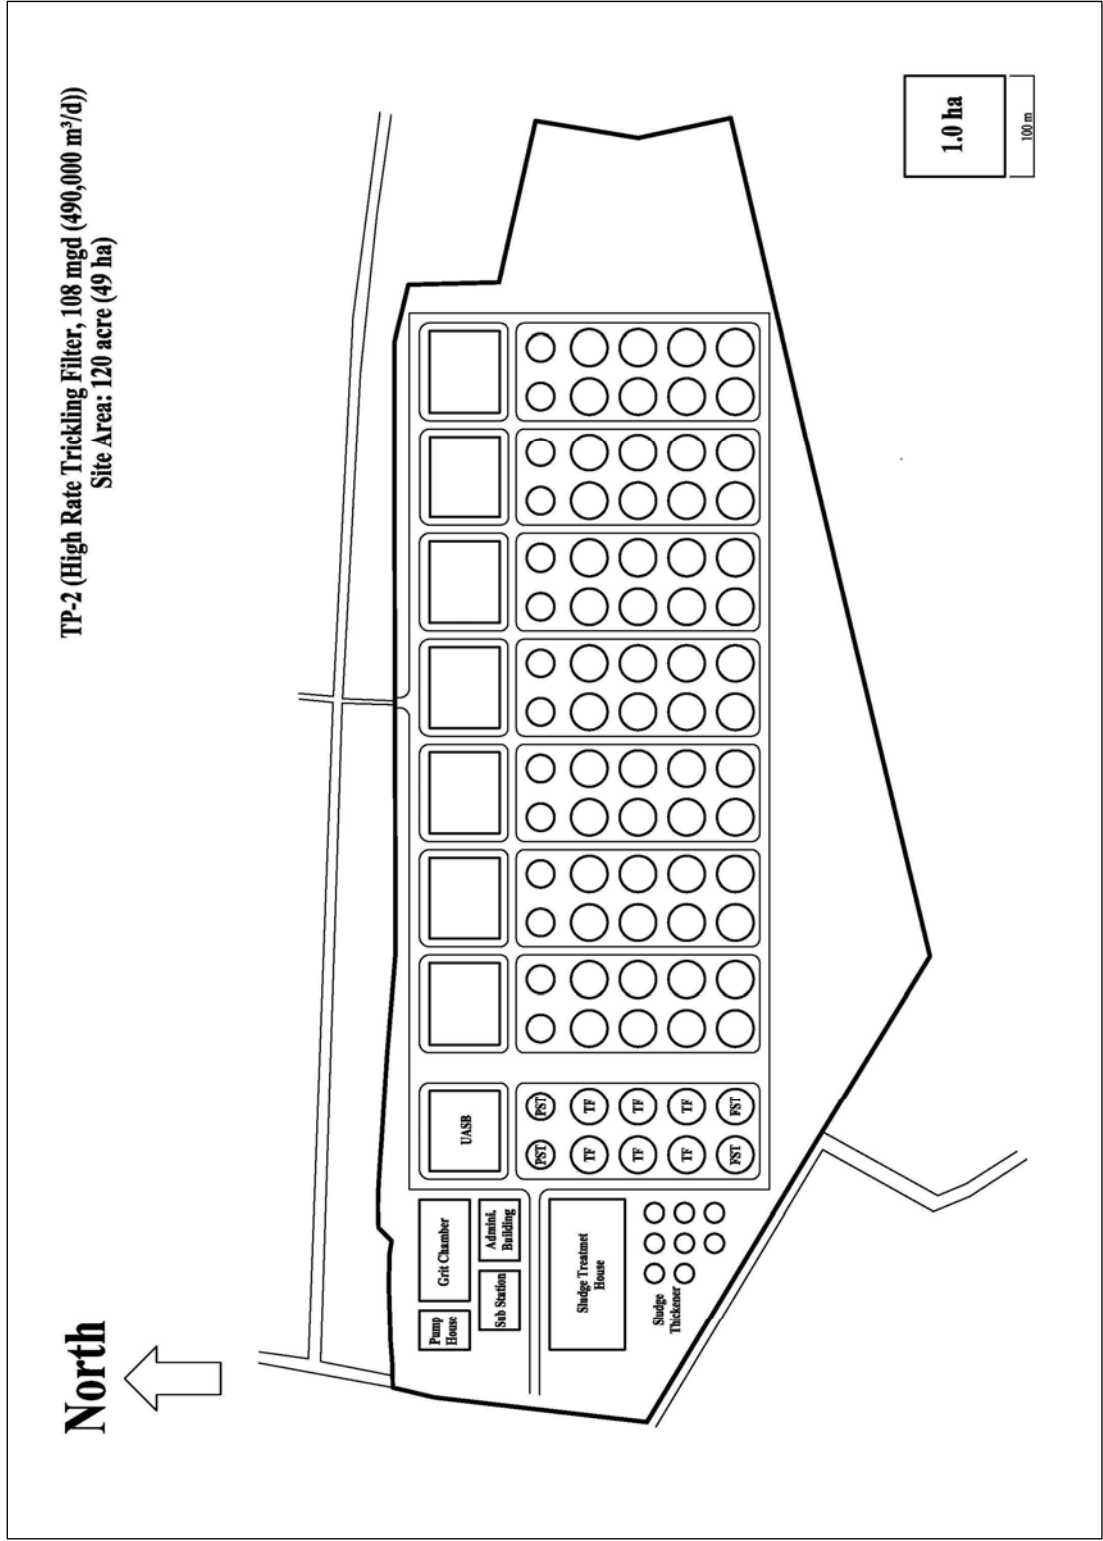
General Plan of Sewage Treatment Plant TP-2
